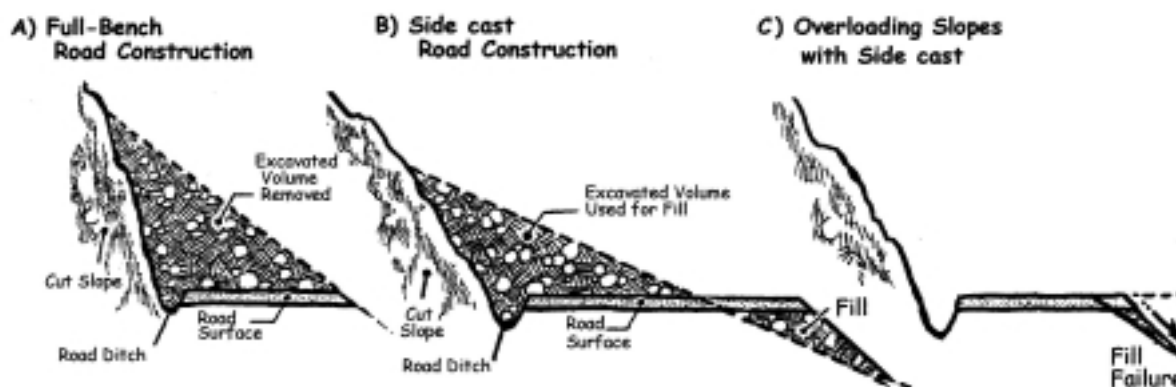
The type of road construction influences the stability of the road. Sidecast roads, built by digging into the hillside to form the inside of the road and using the excavated soil to build up the outside of the road, can cause failure on steep slopes. In full-bench road construction, soil is excavated to a stable location rather than using it as the outer edge of the road.
